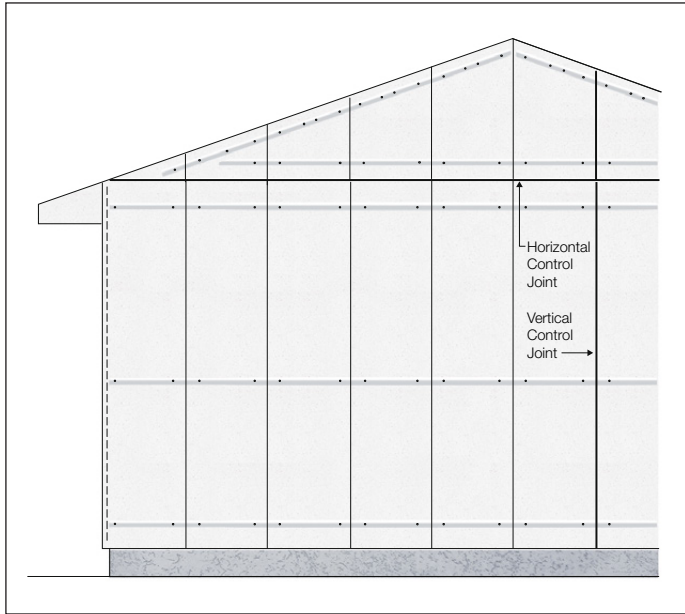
TYPICAL SINGLE STOREY PANEL LAYOUT
